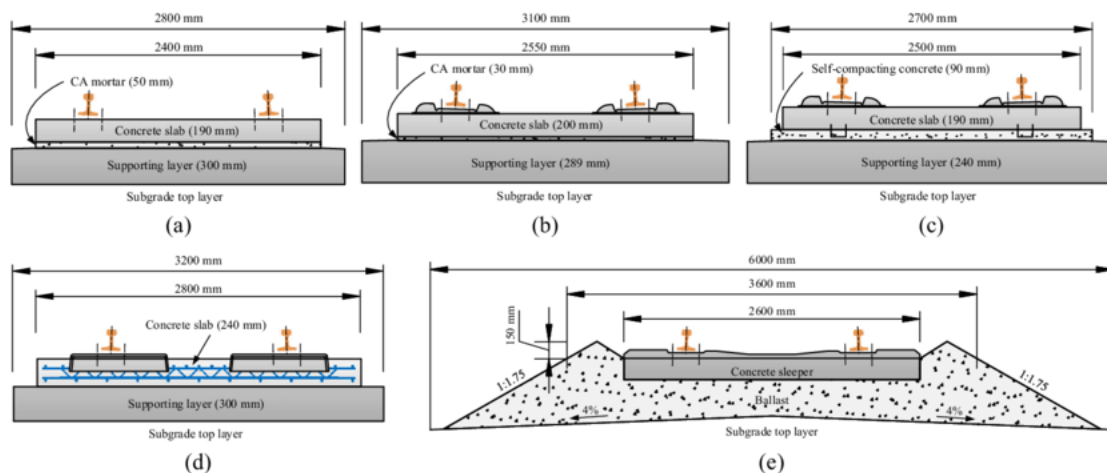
Cross sections of different track types according to Zhai, et al. (2020): a)-b) Slab track with prefabricated concrete slab independent from the lower layers; c) Slab track with concrete slab connected to mortar layer; d) Slab track with bi-block sleepers embedded in a concrete slab supported on lower layers; e) Ballasted track with sleepers.
